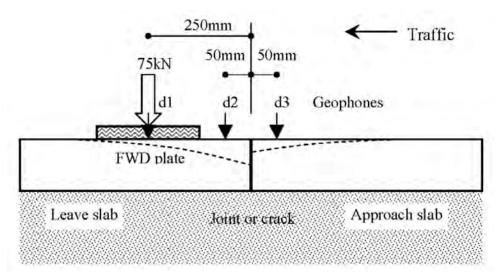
Recommended FWD arrangement for assessing joint / crack LTE and VI as detailed in CS 229 [3]
